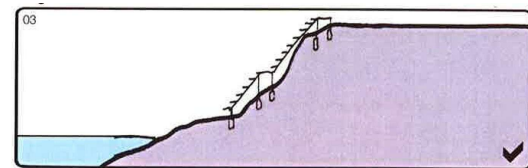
j: New access stairways should have minimal disruption to the landform. They should be lightweight and constructed from steel or timber.(l)
